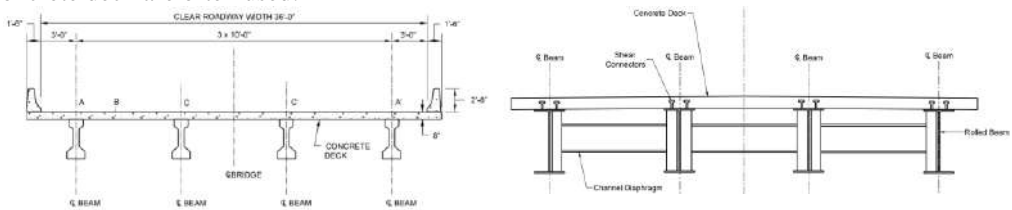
Left: typical U.S.A. precast pretensioned concrete beam bridge cross section; right: typical U.S.A. steel rolled beam bridge cross section [2]
